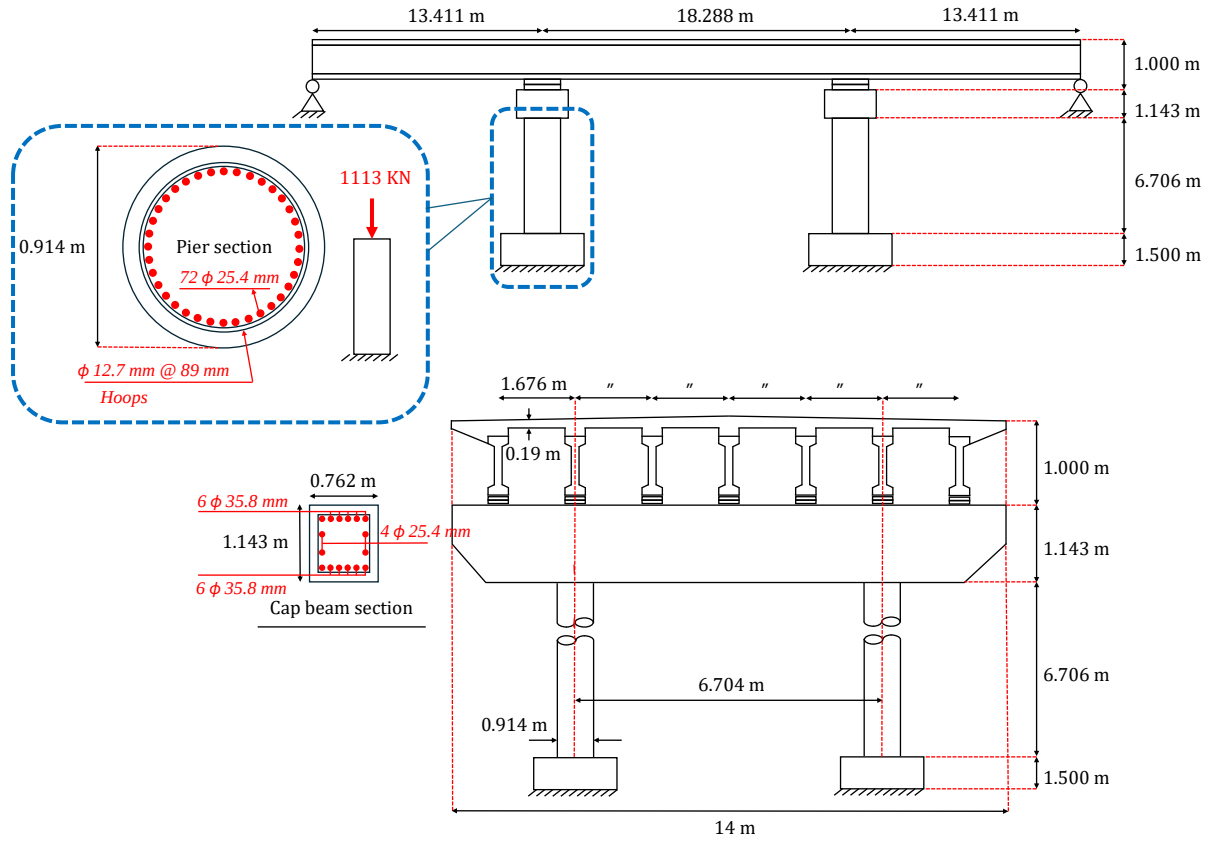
Considered layout of multispan continuous concrete I-girder bridge
